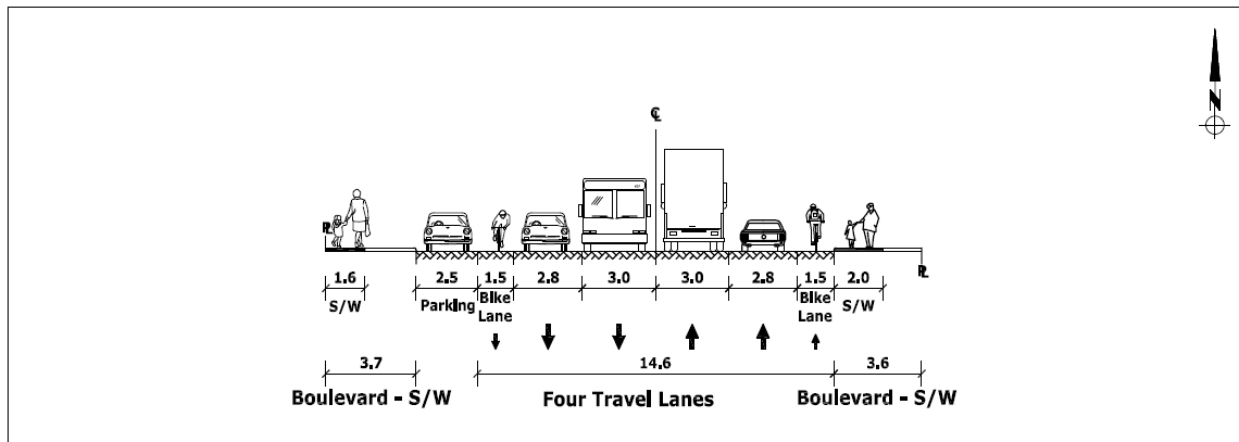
12<sup>th</sup> Avenue to King Edward Avenue - Bike Lanes with Parking One Side
